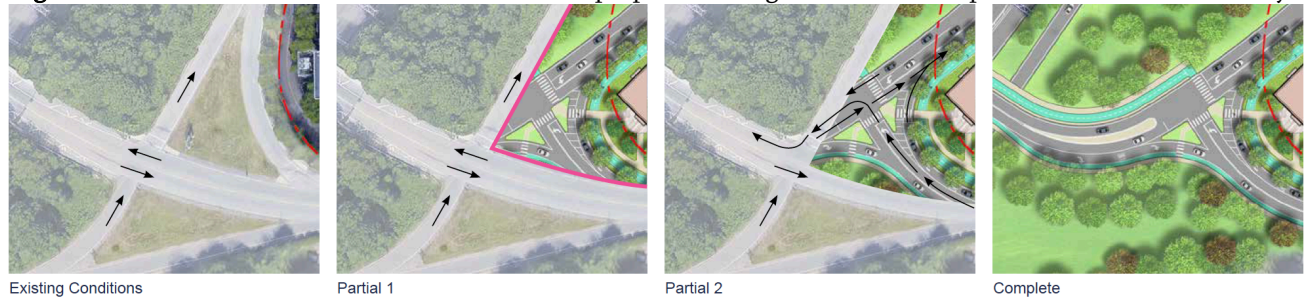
Grove Street/Recreation Road Traffic Maintenance
